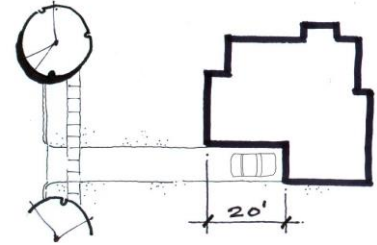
Any front entry garage doors shall be set back at least 20 feet from the front building line where the primary entry of the house is located.
